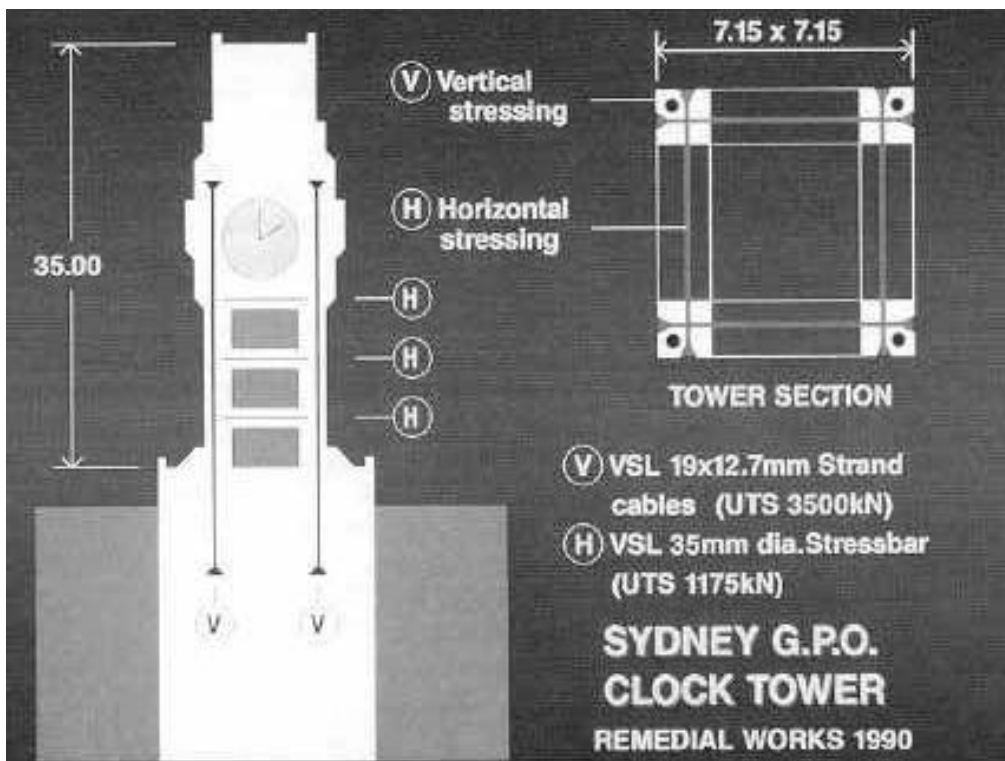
Tendon layout in tower, courtesy of McBean & Crisp, Pty, Ltd.
